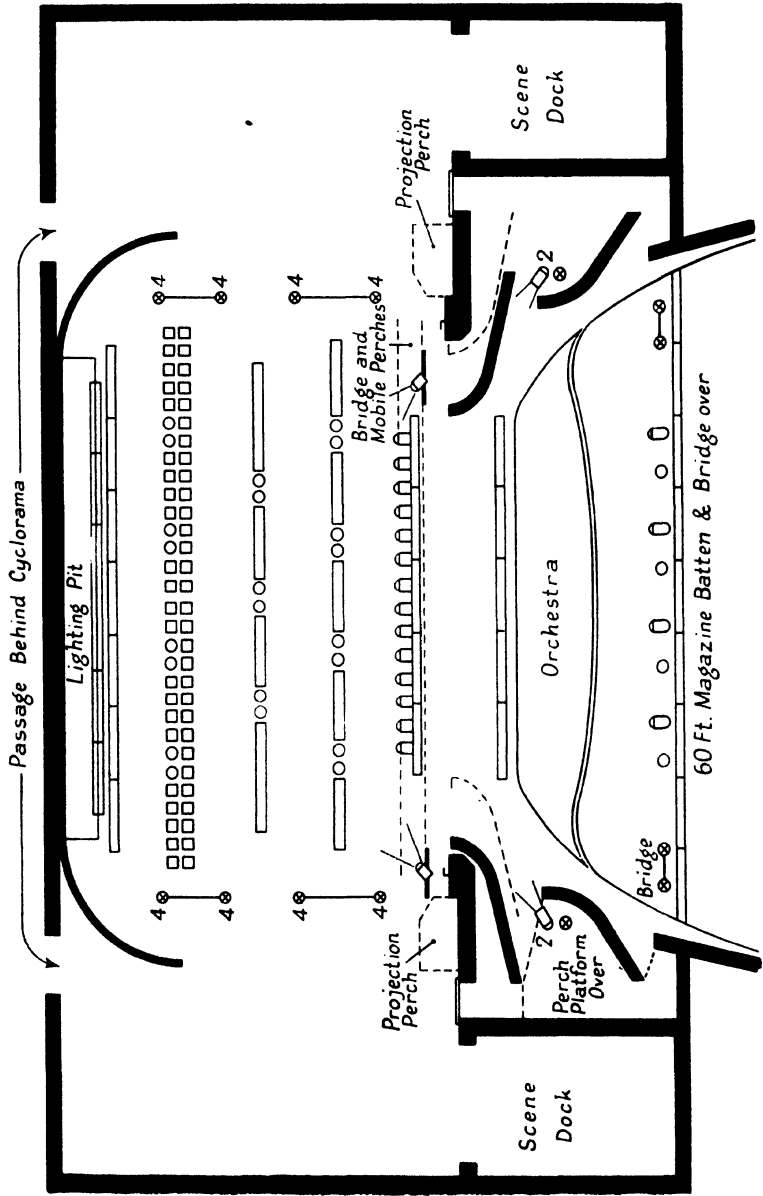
EXAMPLE "G": PLAN: LIGHTING LAYOUT FOR AUTHOR'S MUNICIPAL THEATRE DESIGN
